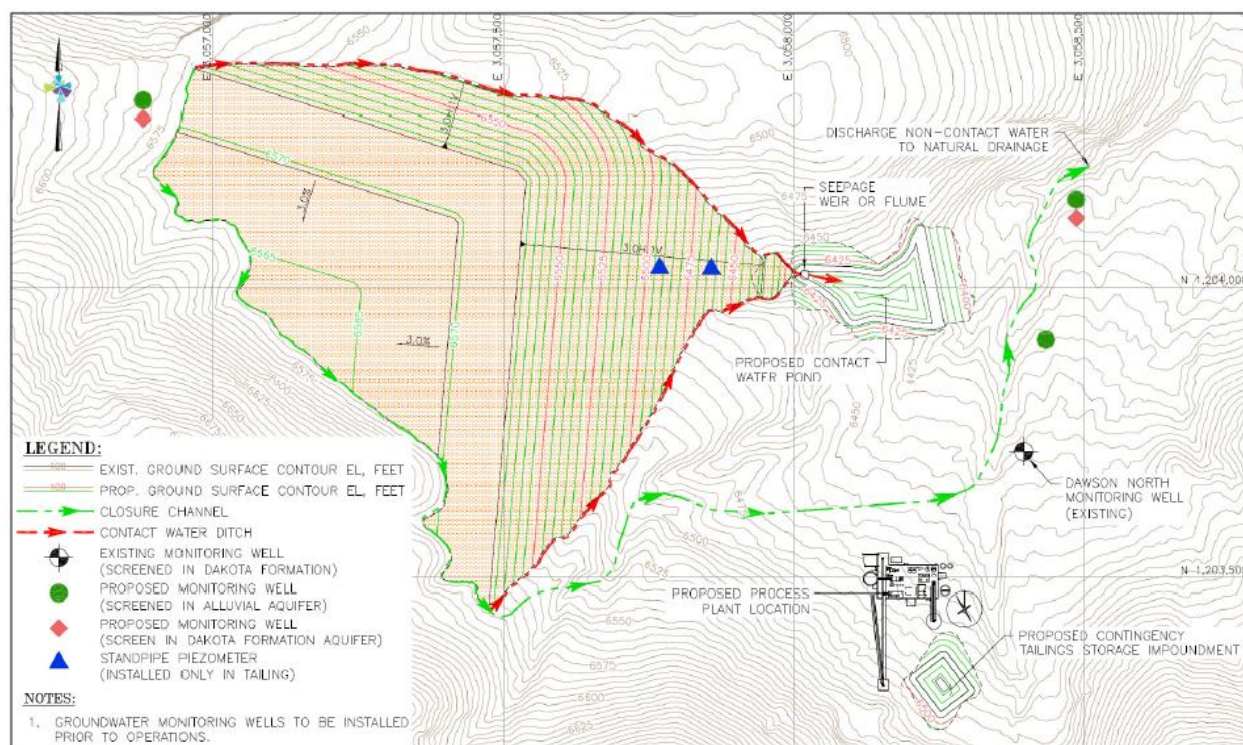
The filtered tailings facility would be constructed with diversion channels (contact water ditches) to prevent rewetting of the filtered tailings by surface runoff. The diversion channels would be designed to accommodate a 24-hour storm with a return period of 10 years during mine operation. On that basis, the probability of rewetting the tailings by runoff is 10% in any given year of mine operation and 41% over the five years of mine operation. Following mine closure, the diversion channels would be reconstructed to accommodate a 24-hour storm with a return period of 100 years, so that the probability of rewetting the tailings by runoff is 1% in any given year of the indefinite period of mine closure. There has been no analysis of the consequences of rewetting either in terms of dam stability or increasing the susceptibility of the tailings to liquefaction. Figure from Environmental Alternatives (2021b).
